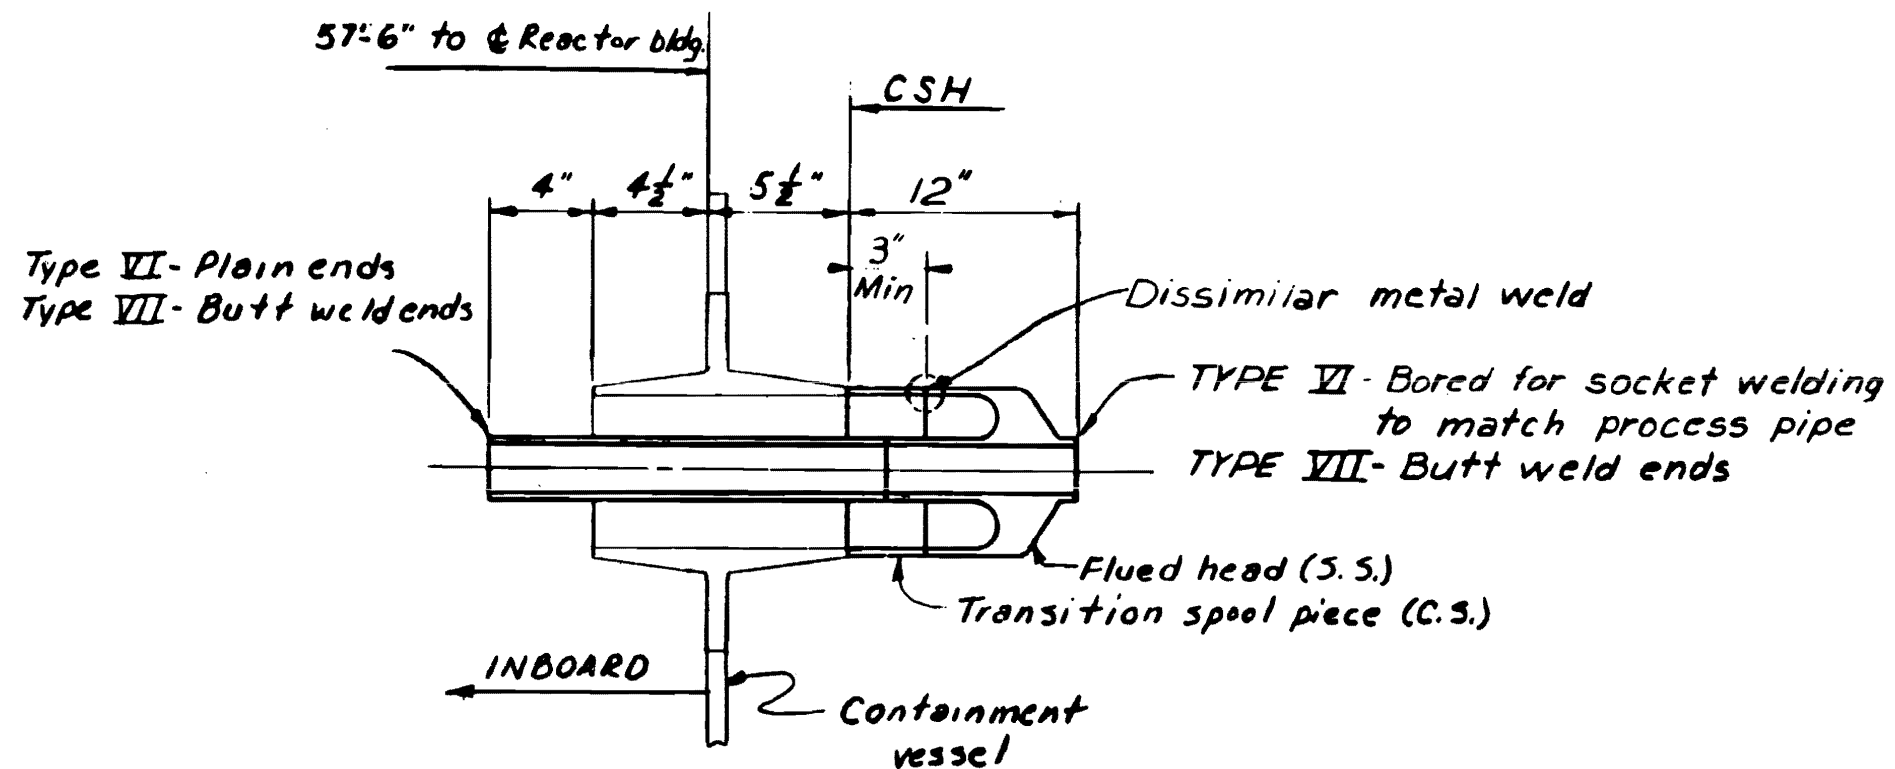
Type VI and VII (Type VI for Socket Weld SS Process Lines, Type VII for Butt Weld SS Process Lines)
